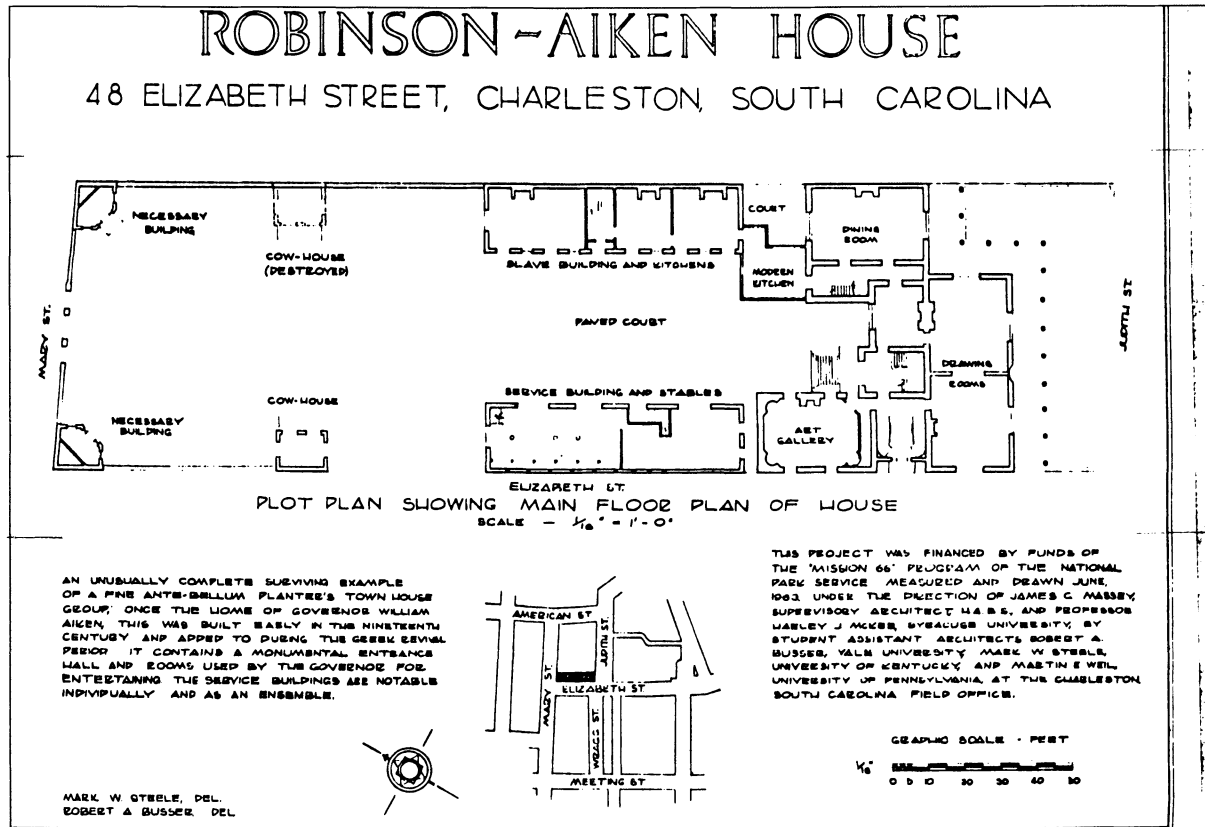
Plan of the Aiken-Rhett House and Its Outbuildings, Charleston, South Carolina. Drawn by Mark W. Steele and Robert A. Bussler, 1963, Historic American Buildings Survey, courtesy of the Library of Congress.
